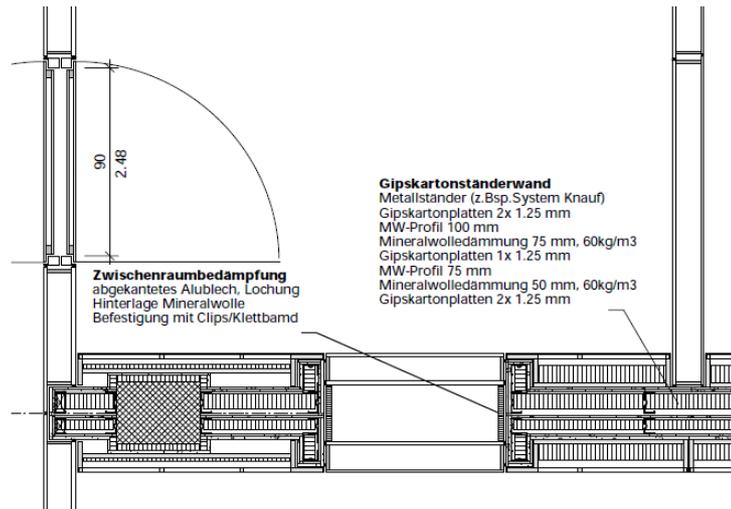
Horizontal section through typical intersection between glass- and gypsum-board walls. [1]
